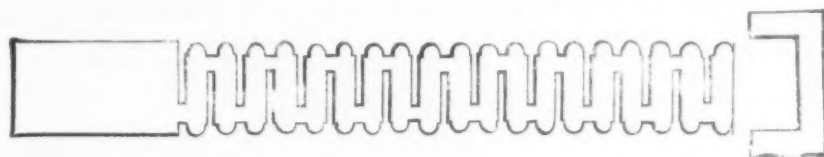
Full Size Section of the Side Stile and Sliding Strips at the Side.
